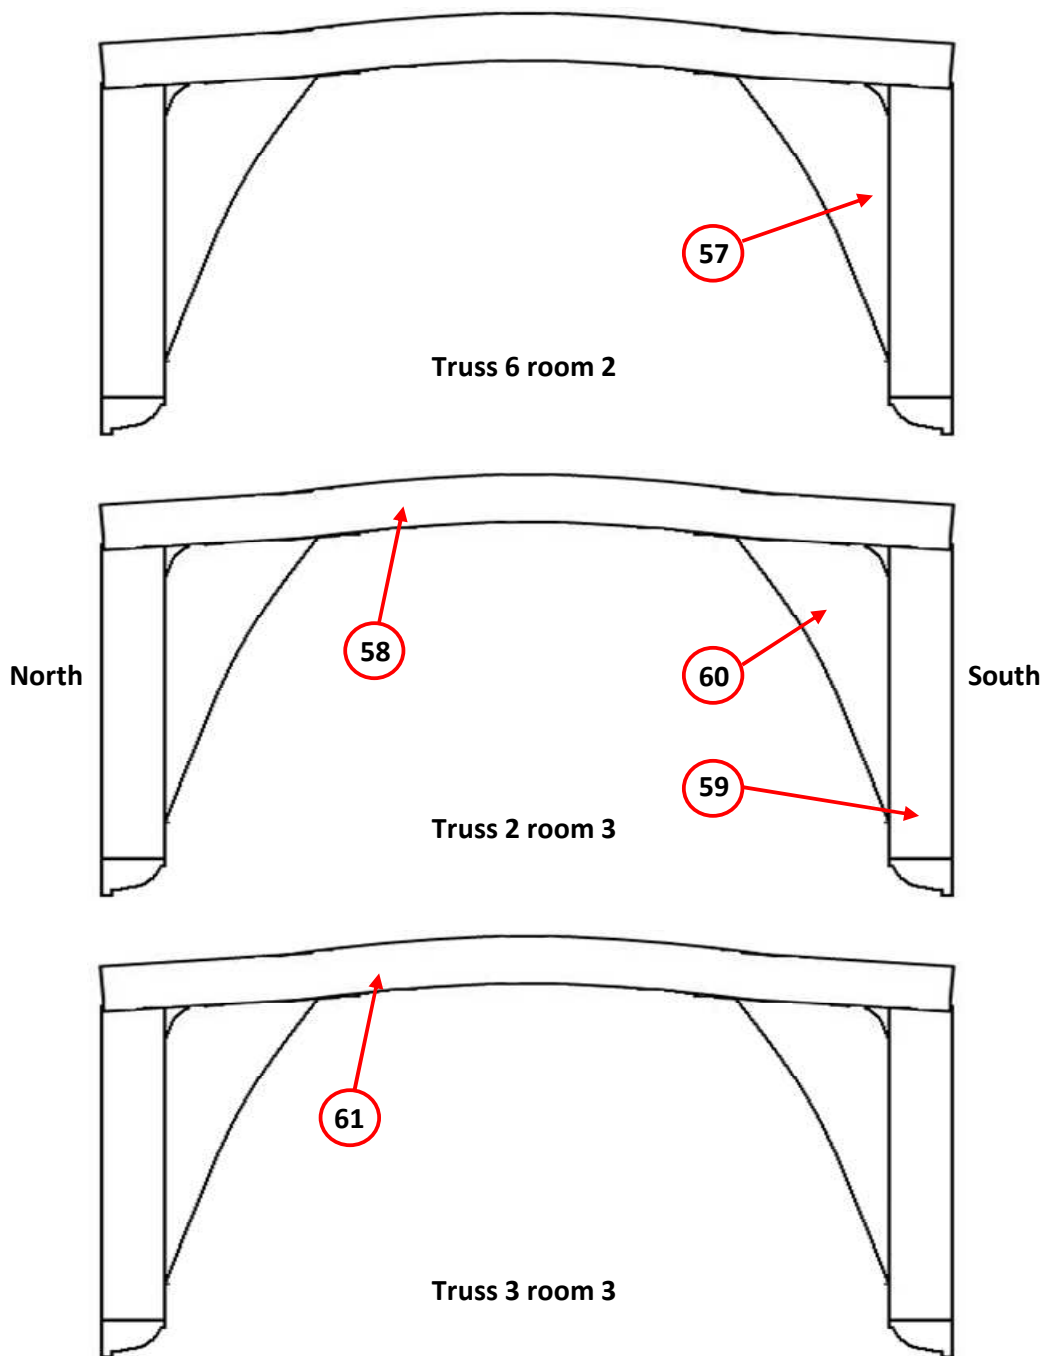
c: Schematic drawings through the trusses of the first floor of the gatehouse to locate sampled oak timbers
